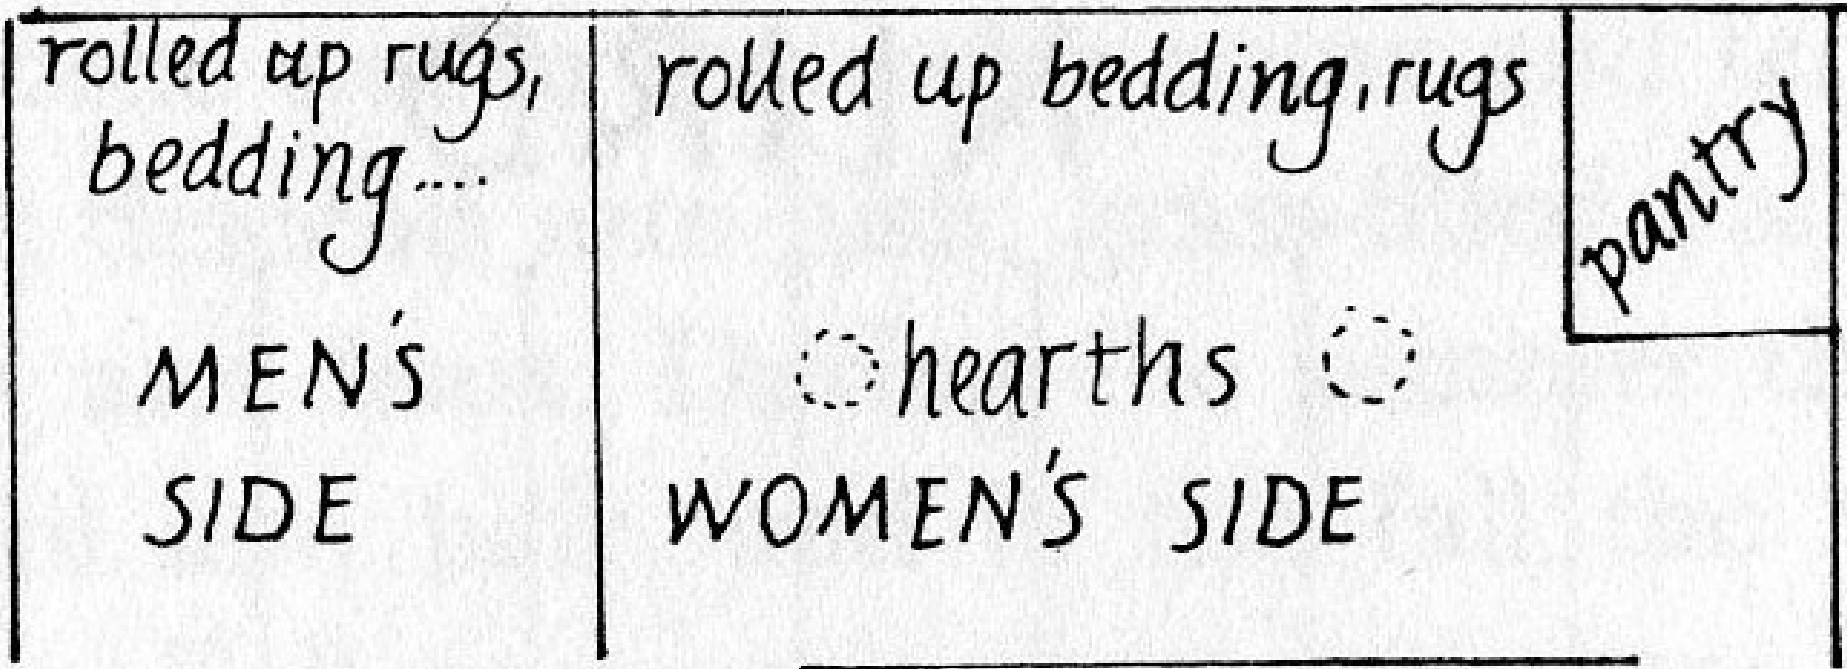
Ground plan of siāh čādōr used in spring at the foot of Zaura.
